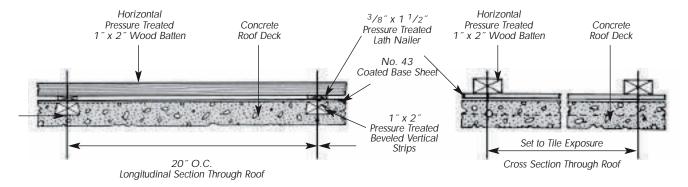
Application of Batten System to Poured Concrete Roof Deck
